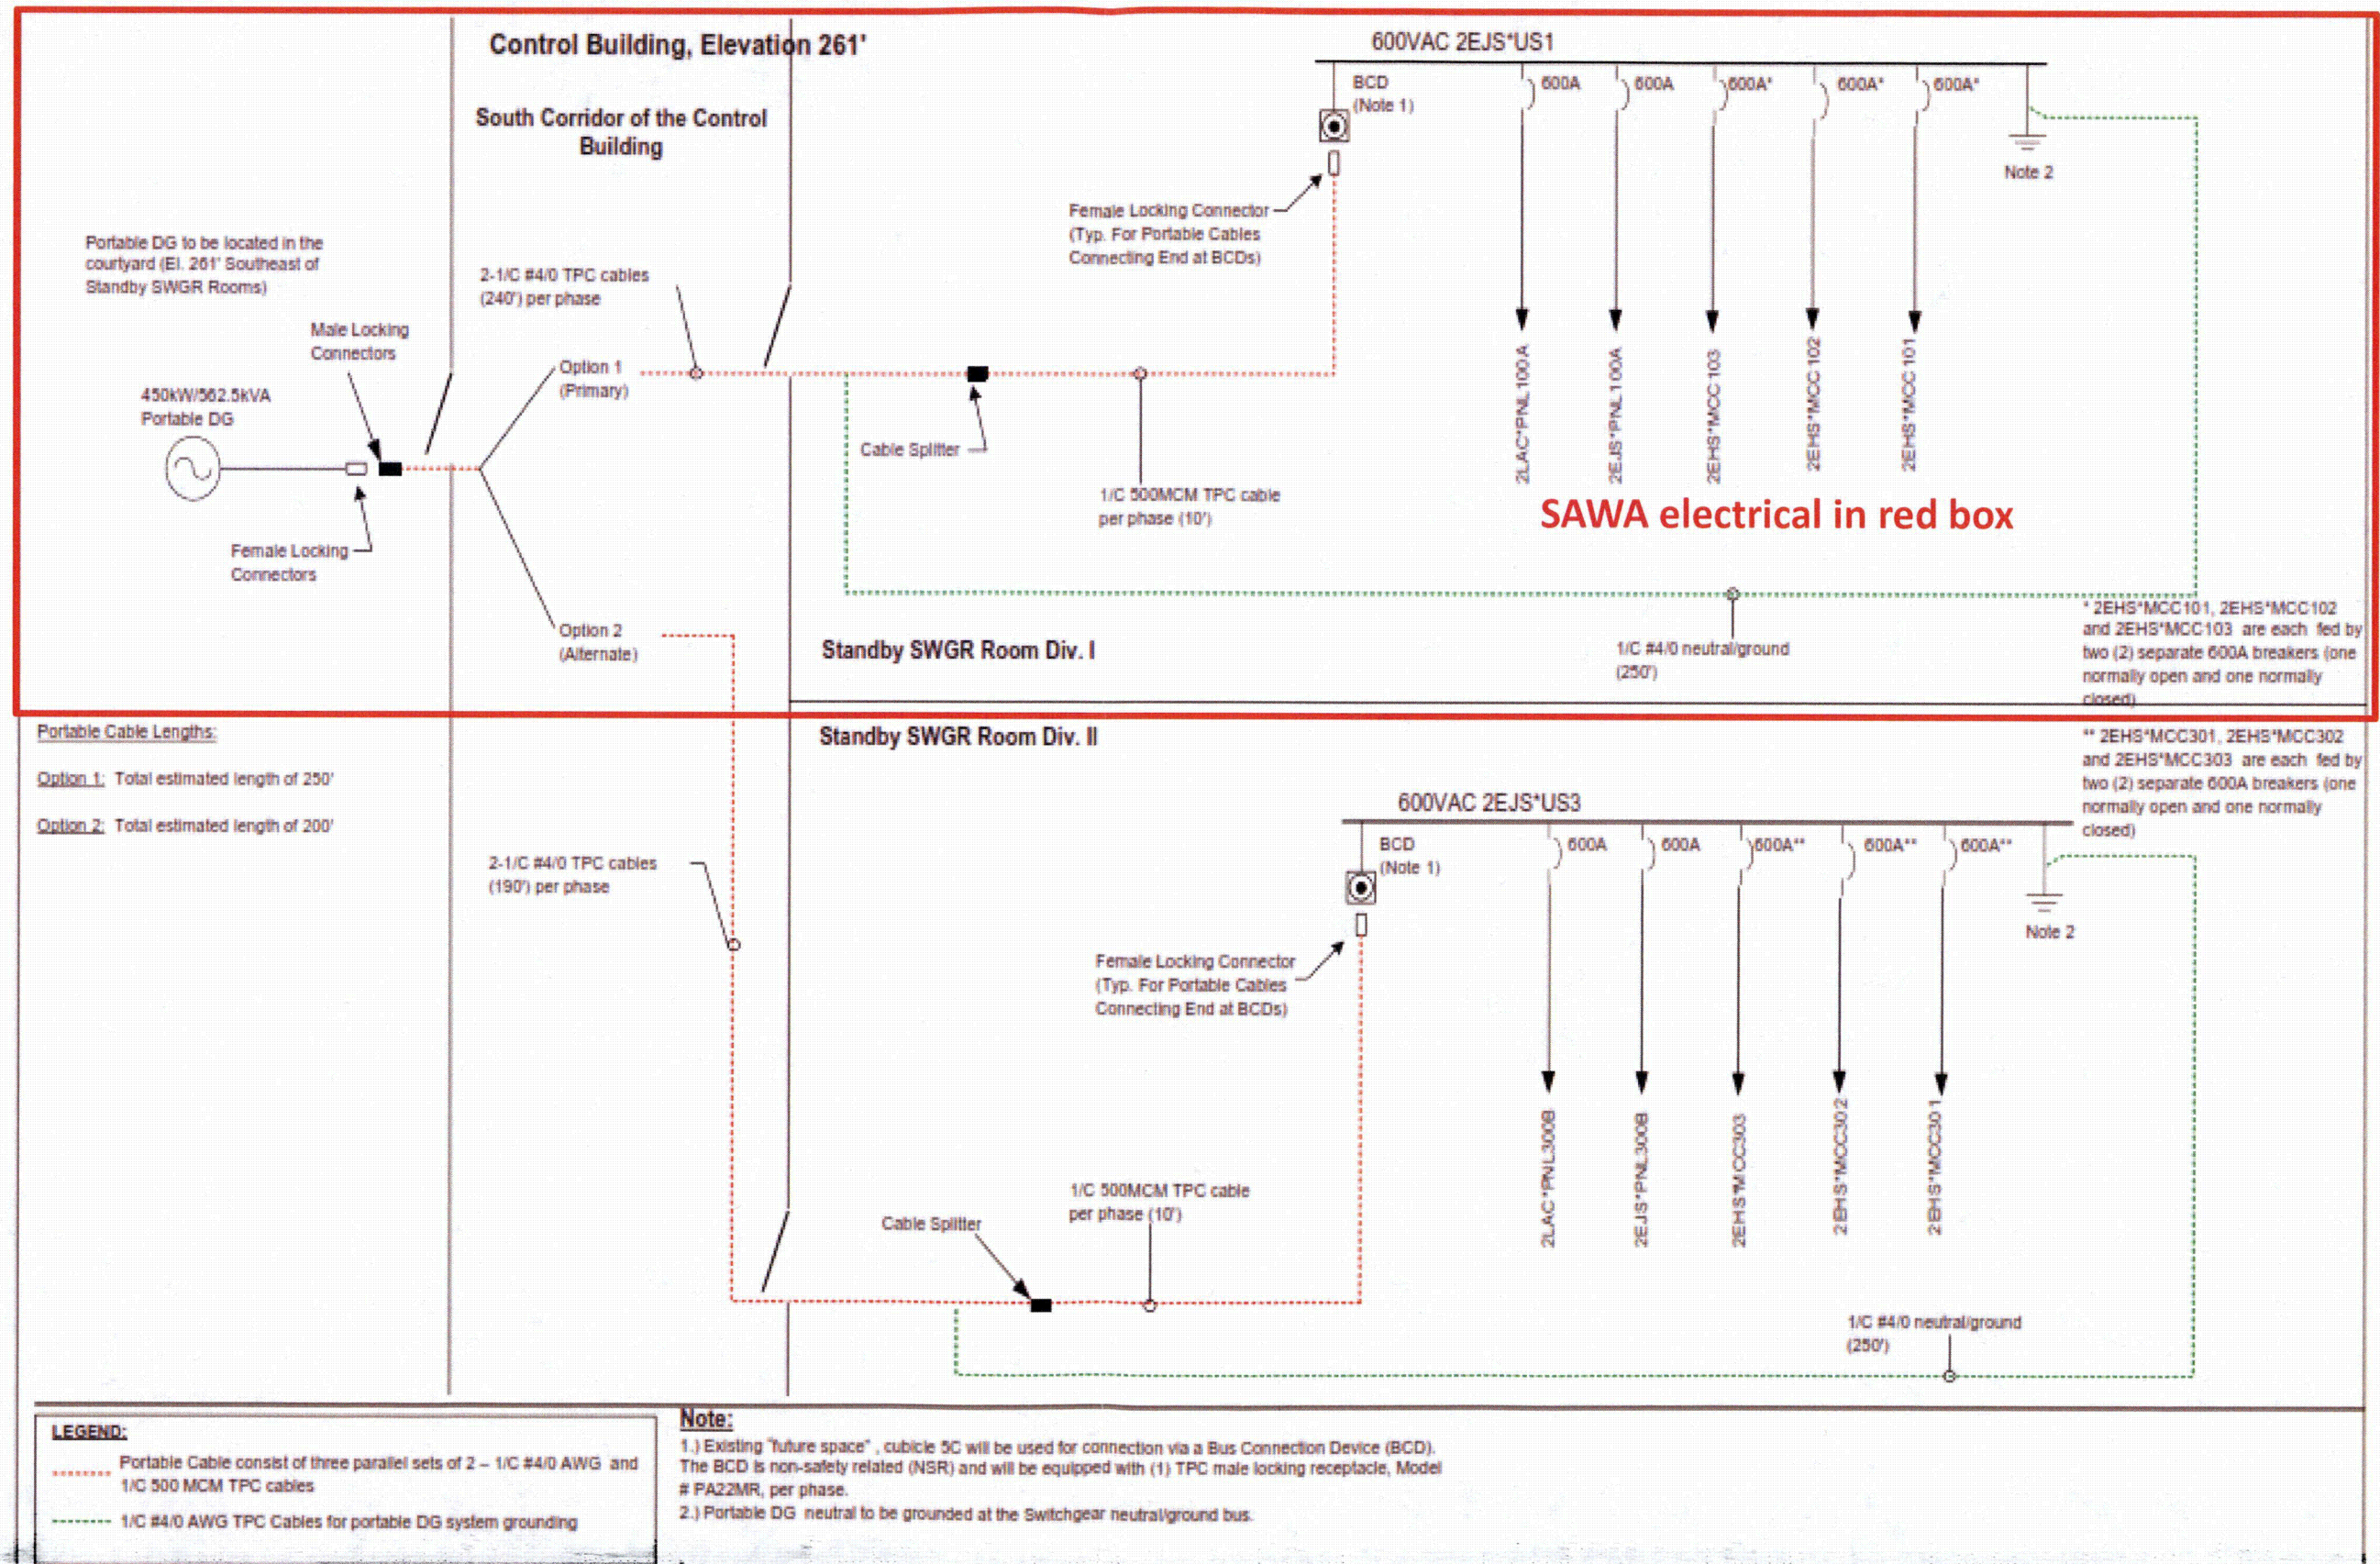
P&ID Layout of SAWA, Pathways and Site Layout (*preliminary*)
